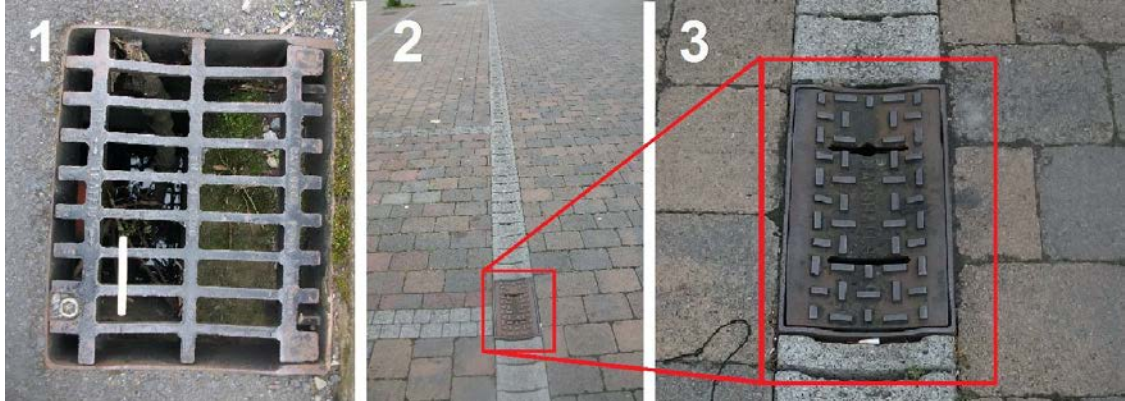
Typical drainage solutions used in Irish Home Zones. Image 1 shows a drain cover with large openings that allows many items to fall through. Image 2 & 3 shows a continuous covered drainage channel with permeable paving and sealed drain cover that is more appropriate to a pedestrian and child friendly environment.
